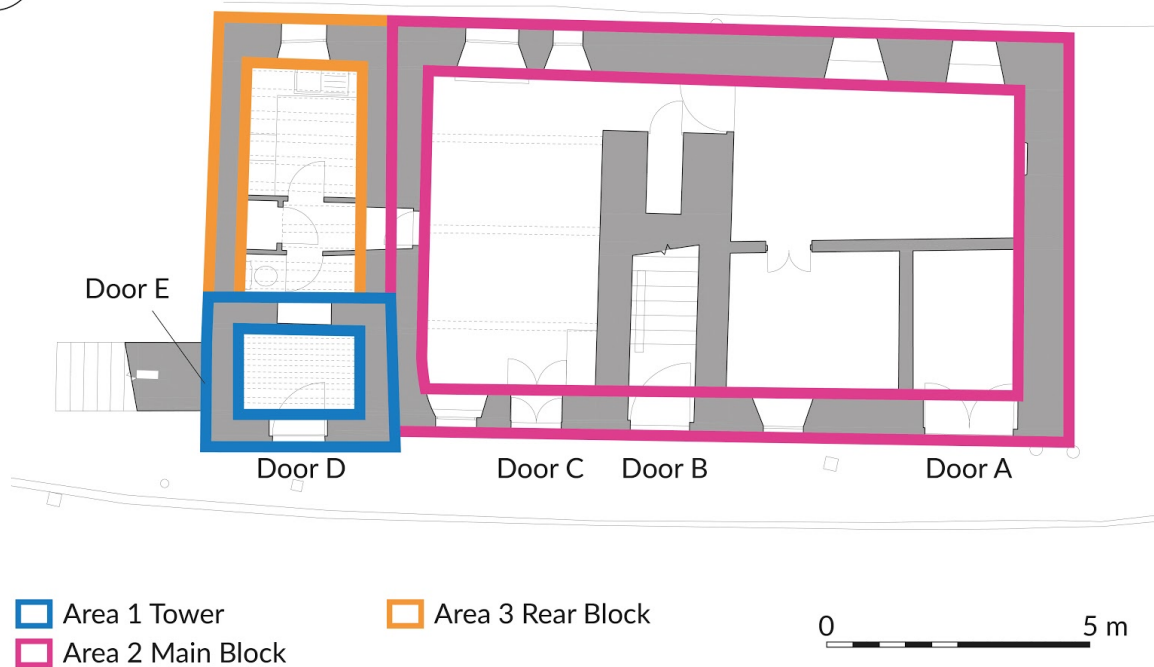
Areas of Town House based on the current ground floor plan provided by Arc Architects Ltd.
